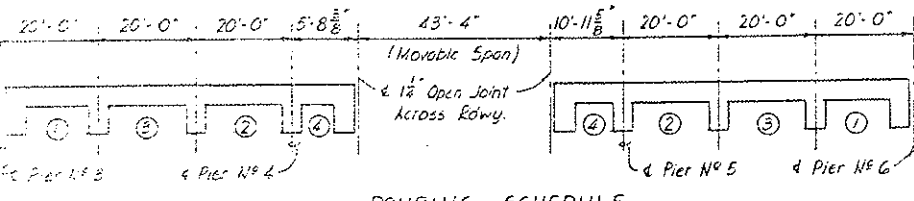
DETAILS OF SPANS ADJAC TO MOVABLE SPAN (SPAN 3)
